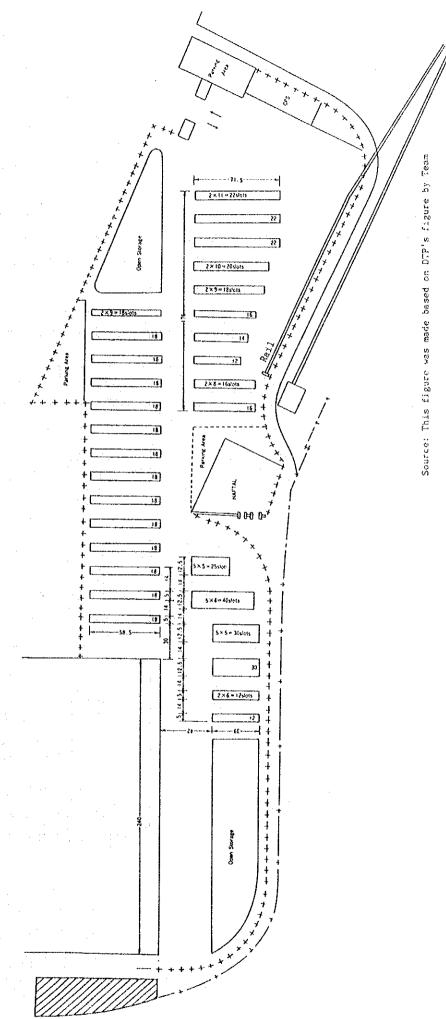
The Layout of the Container Terminal at Berth No.1 and No.2
